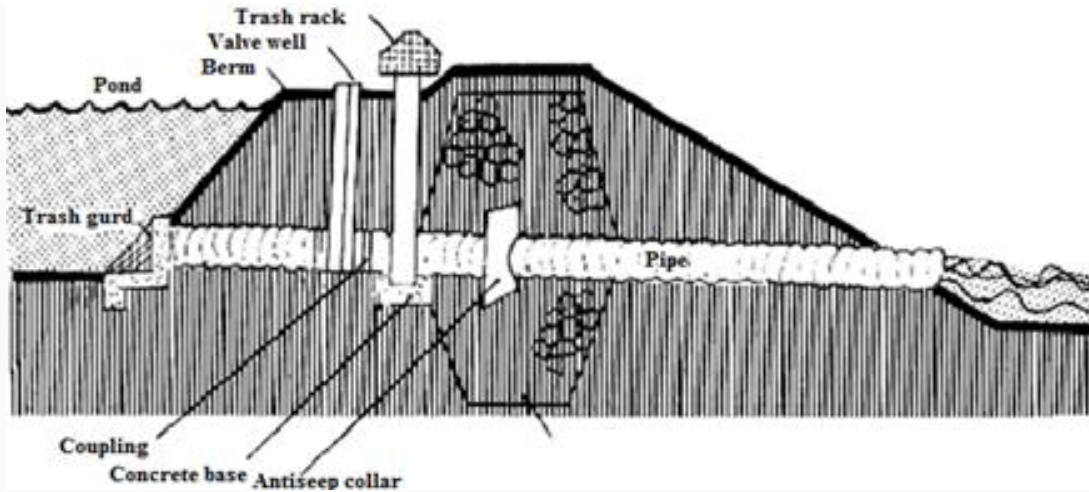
A drop-inlet pipe spillway with drain pipe.
